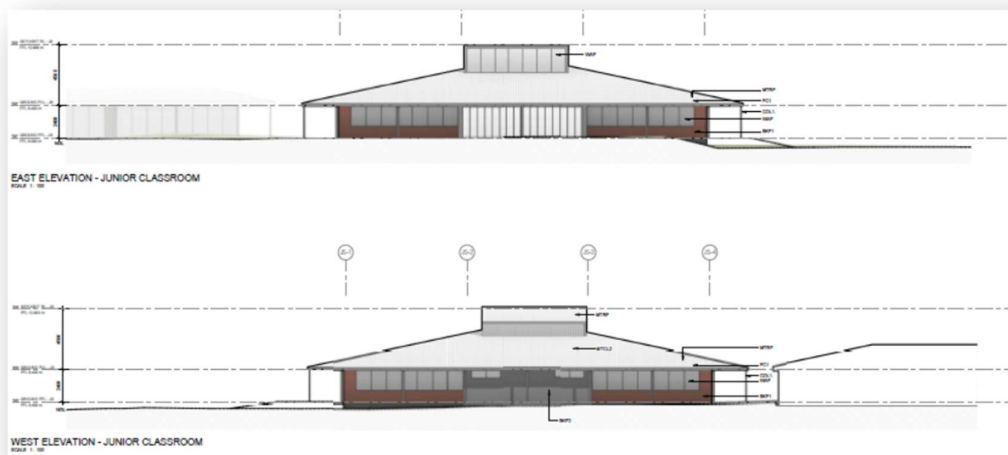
Elevations Plan (Drawing DA-JS-30-02) showing the east and west elevations of the Junior School Classroom (Source: Cox Architecture 2022)
